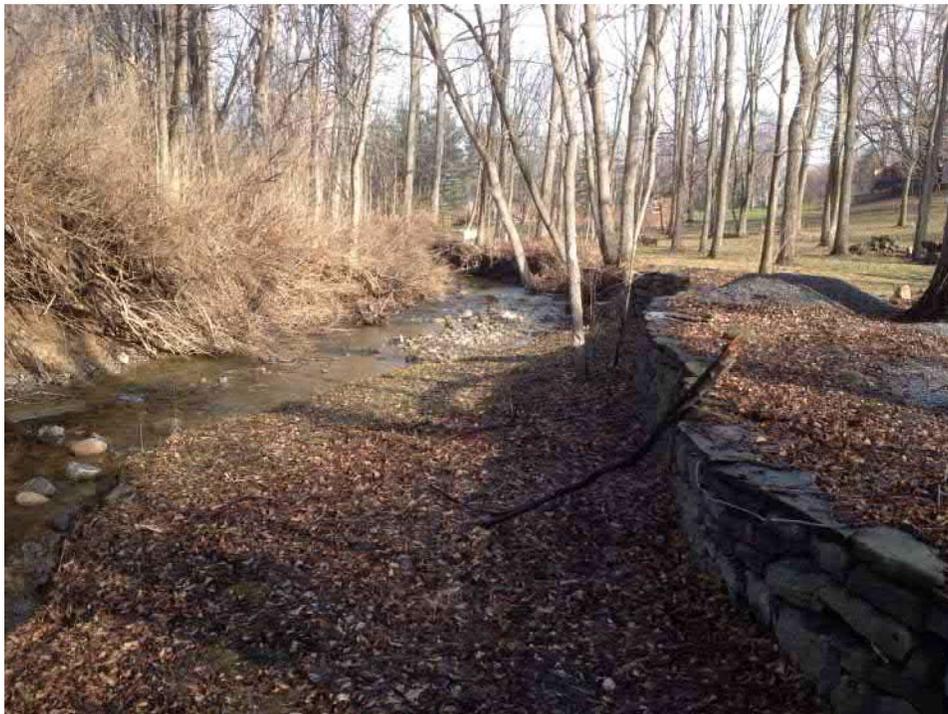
View facing downstream just below the East Lake Rd. Bridge. Retaining wall construction and filling of floodplain leads to channel confinement and increased flood velocity, contributing to erosion of the right bank immediately downstream.
